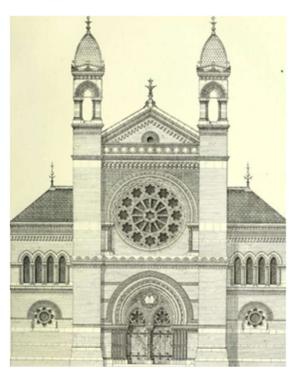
Front façade elevation, New West End Synagogue, London, architectural drawing 1877. Magazine illustration. Source: *Building News*, July 1877.
